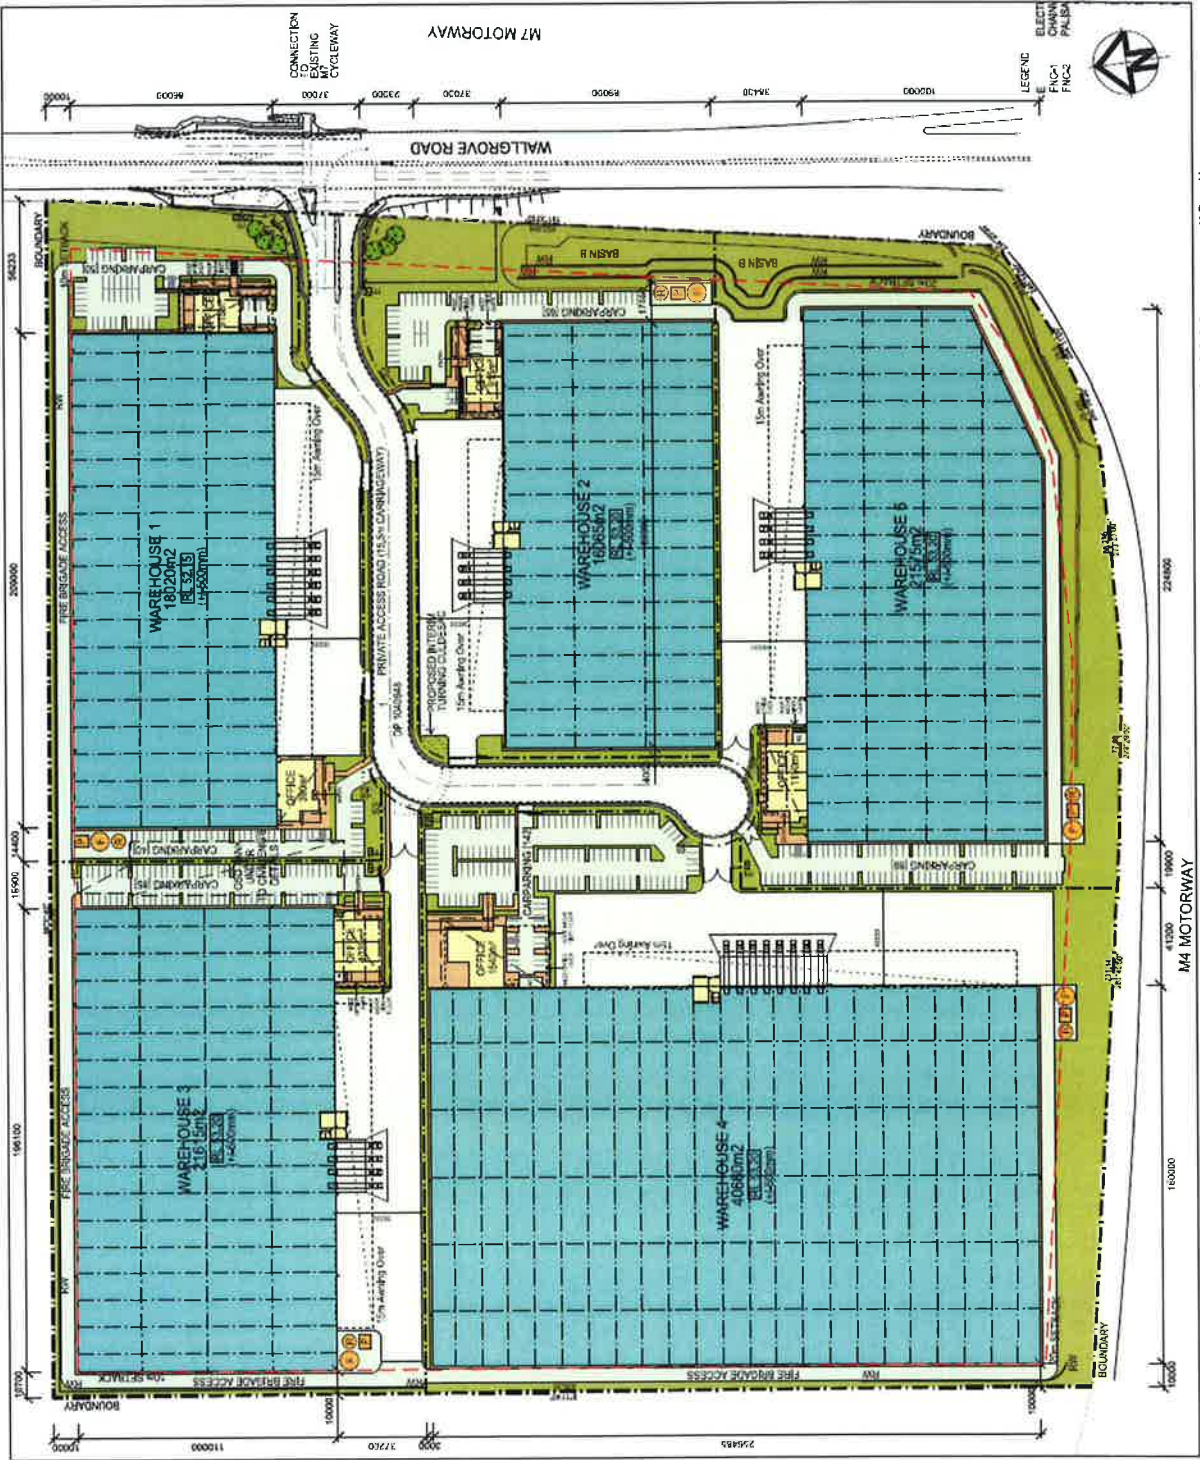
Calibre Eastern Creek Layout / Proposed MEP Concept Plan Layout (MP 09_0099, as modified)
